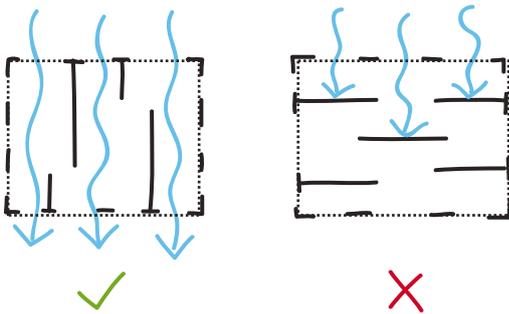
Walls running parallel to the breeze, aid in cross-ventilation.
